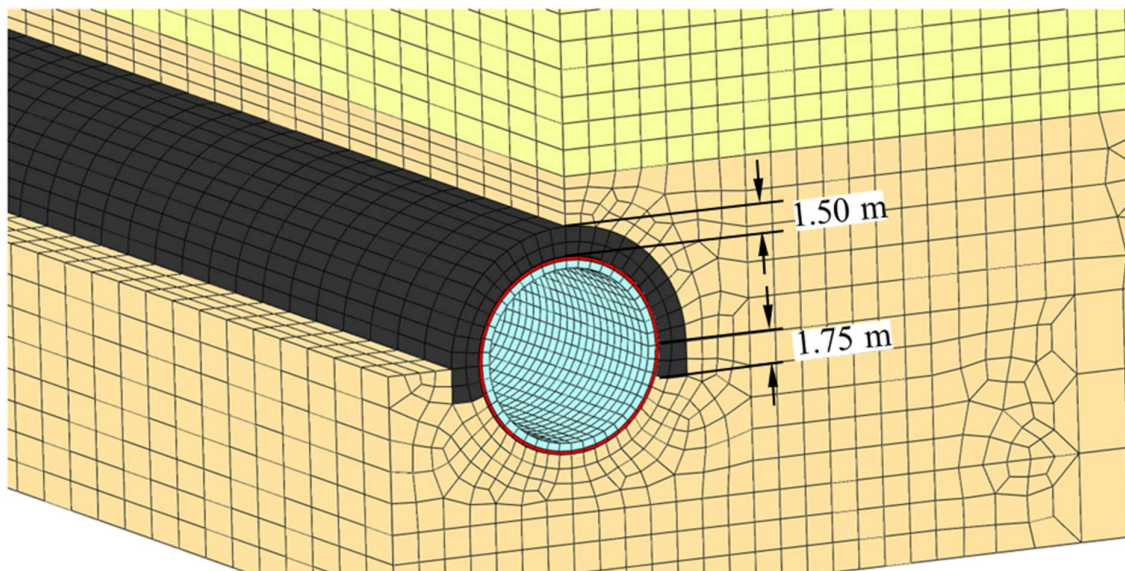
Detail of the model of the excavation with the jet grouting umbrella
